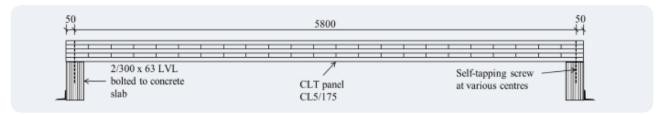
Cross section of single CLT panel connected to frame with a single screw connection.
